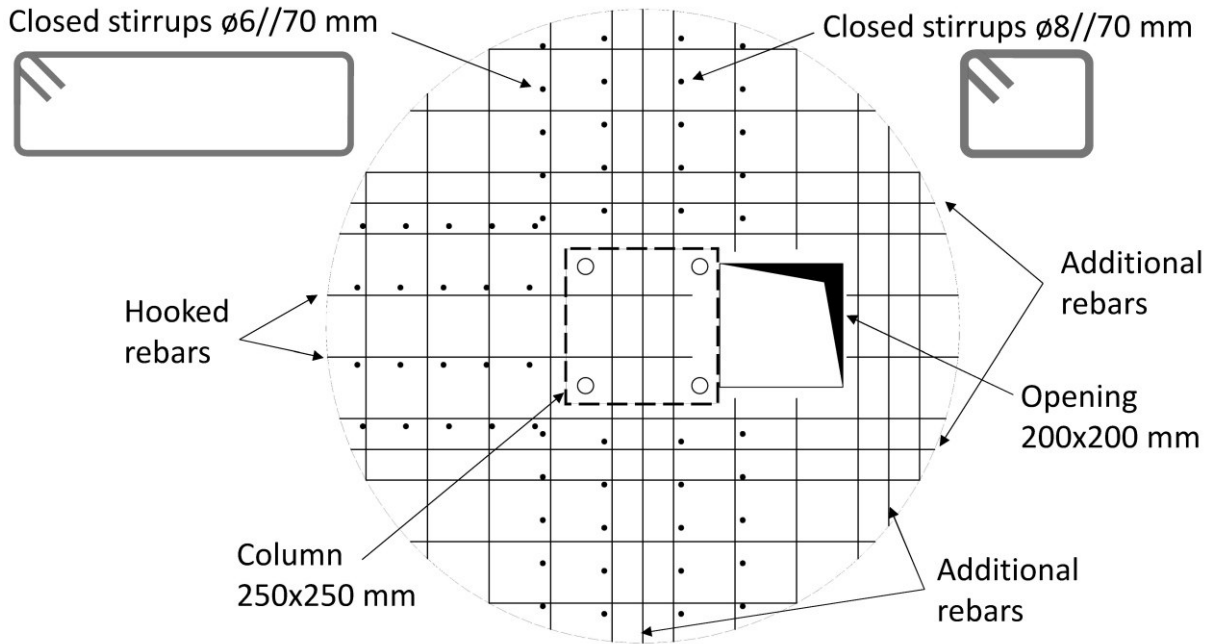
Shear reinforcement arrangement specimen SO1-03.
